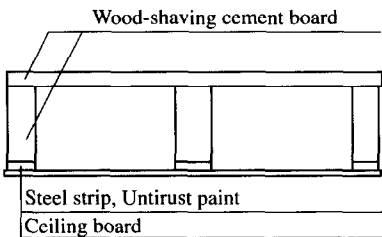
Proposed cross-section of steel strip reinforced ribbed roof panel.
